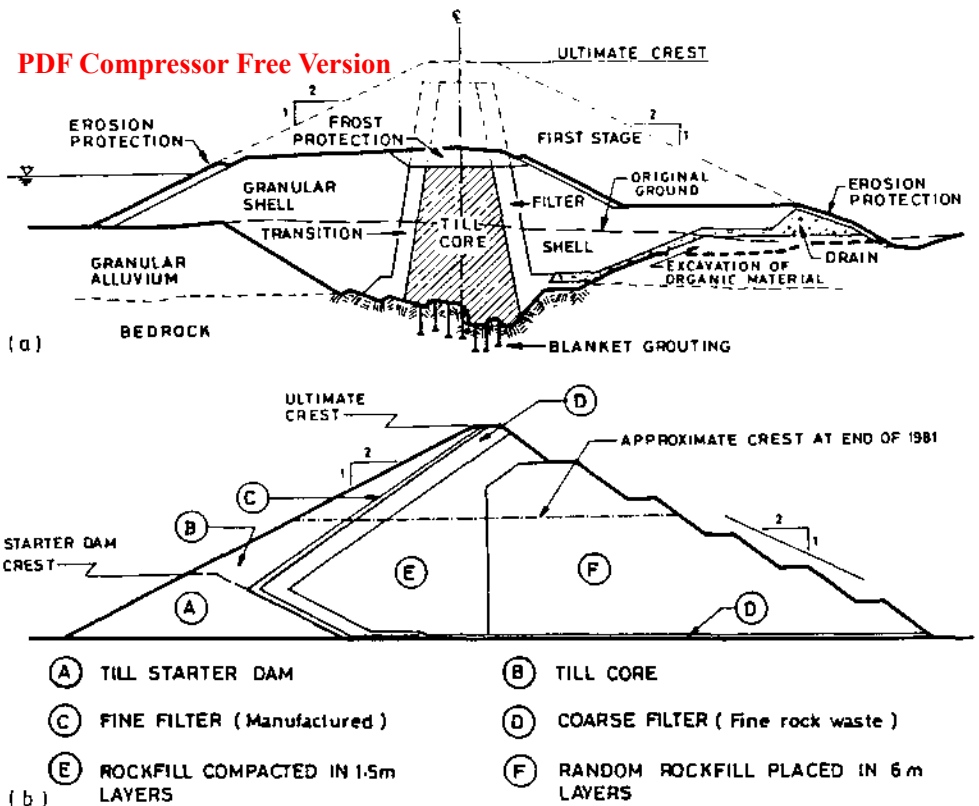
Staged construction of tailings dams a) Page-Williams Mine (Welch et al. 1987); b) Afton tailings dam (Lighthall 1987) from Minns (1988).
